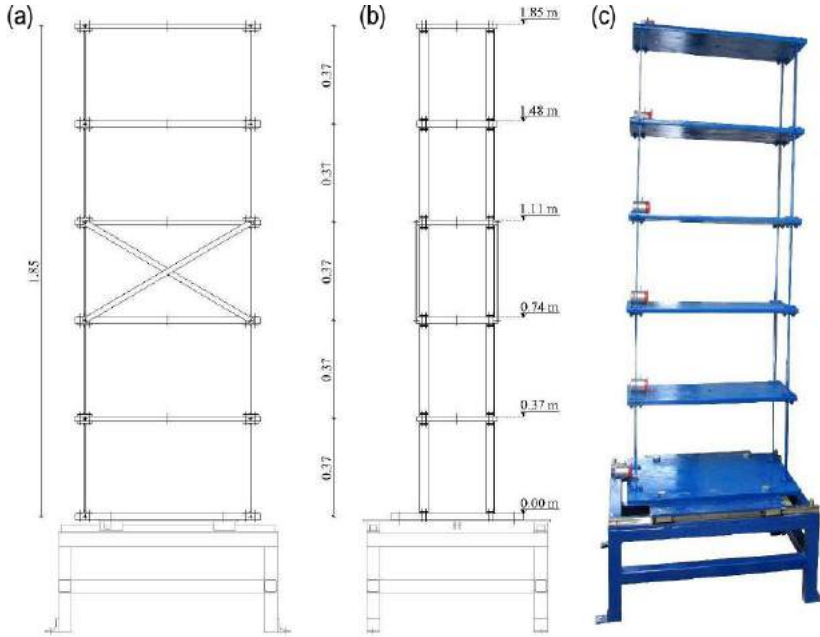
Test structure: elevation (front)(a), elevation (lateral) (b), 3D image (c).
